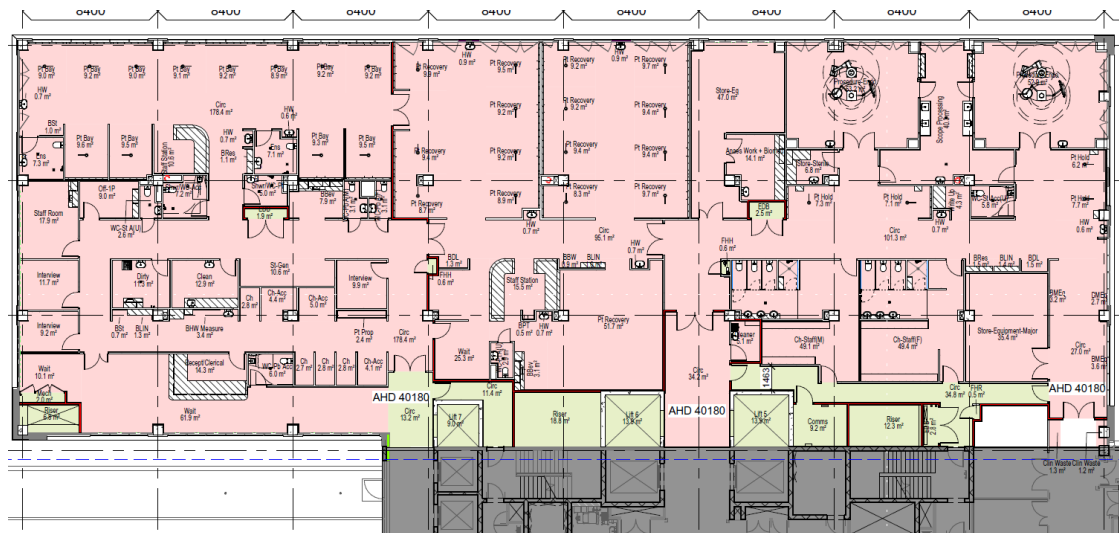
Proposed amended L06 Floor Plan (Source: Conrad Gargett)
